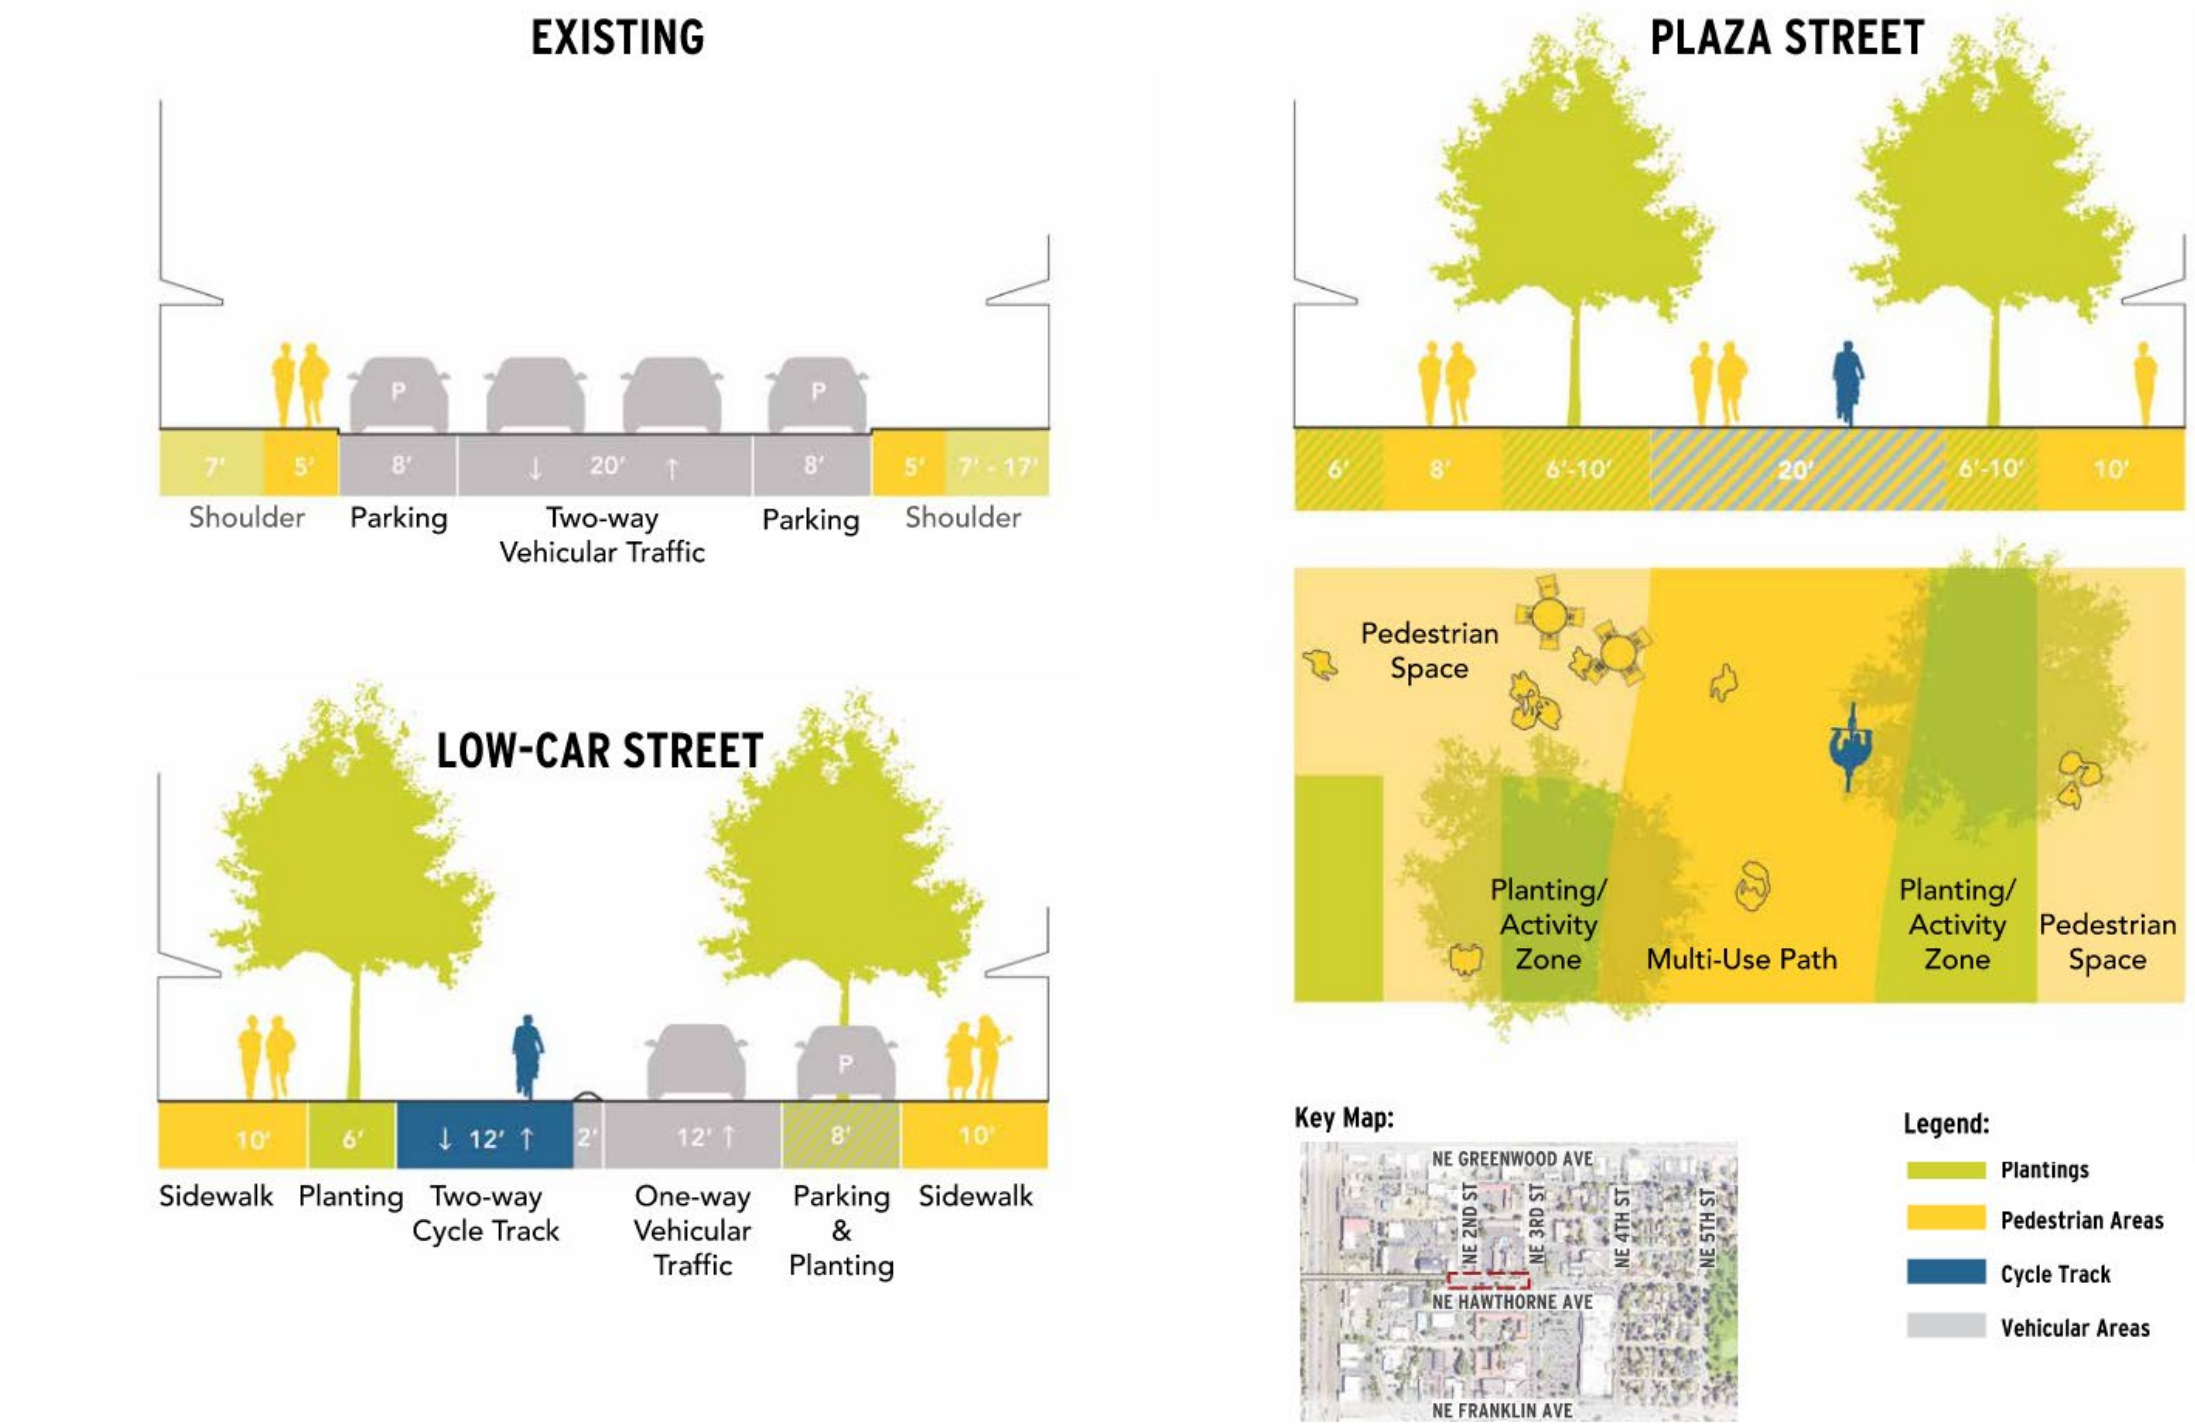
EXAMPLE CROSS SECTION IDEAS – WEST OF 3RD STREET
